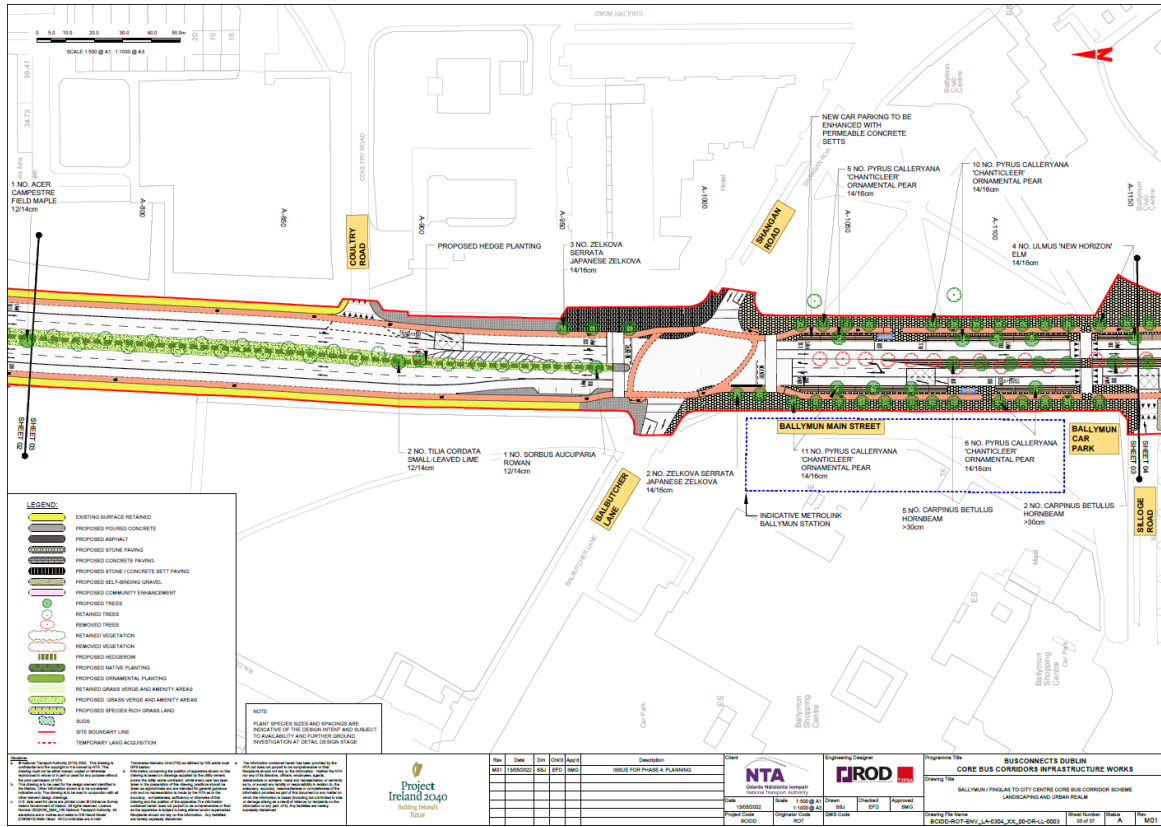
Landscape General Arrangement Drawing Sheet 3 at Ballymun
